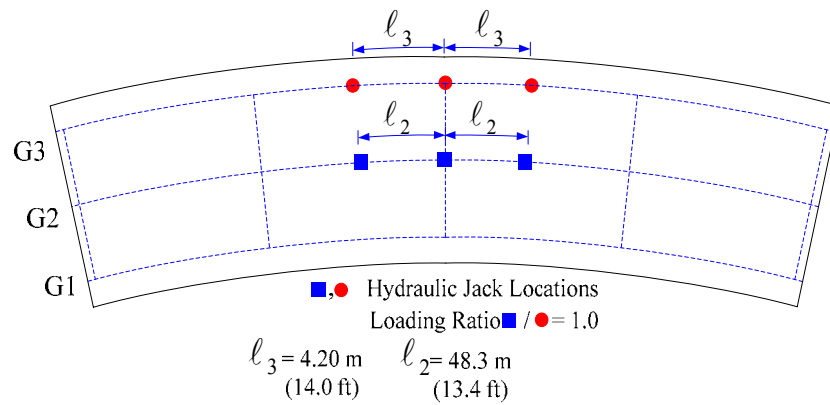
Six hydraulic jacks positioned on the outside lane of the test bridge slab for Test 2, corresponding approximately to a single AASHTO design vehicle plus lane load.
